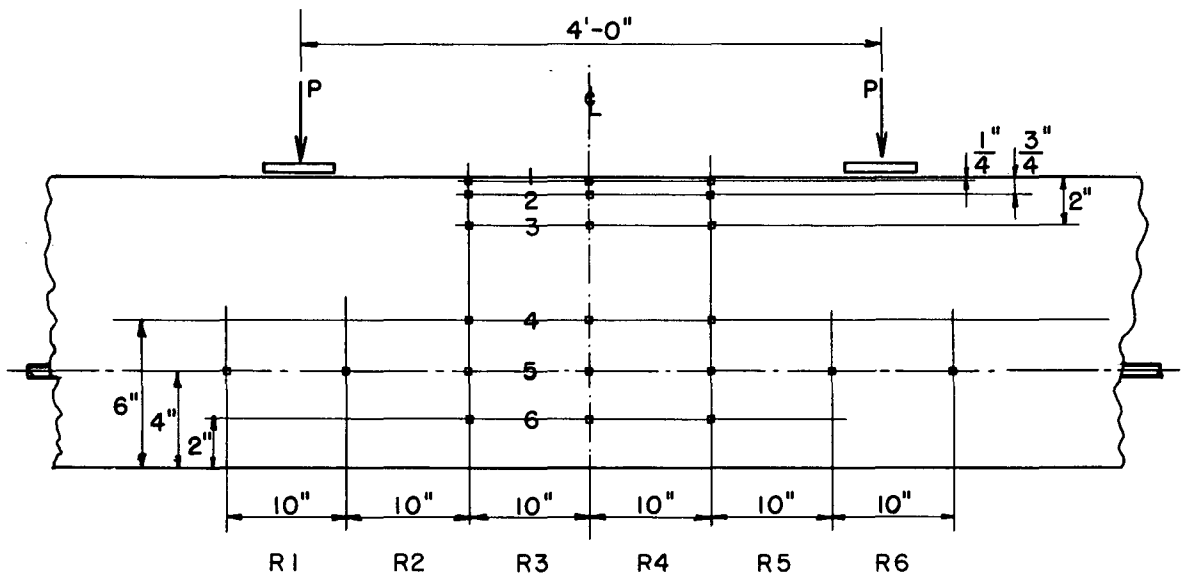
GRID LAYOUT FOR MEASUREMENT OF CONCRETE DEFORMATIONS (SOUTH FACE)
